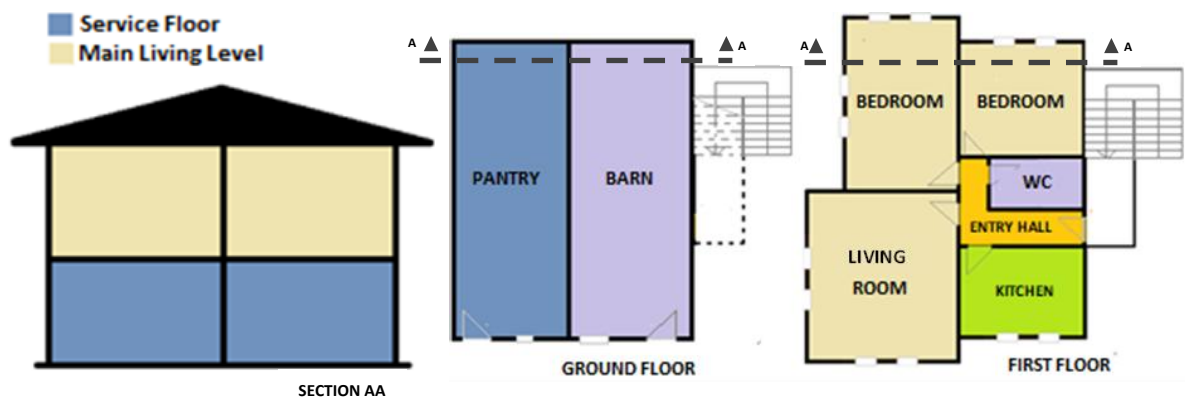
Diagrammatic Drawings of Floor Plans and Section AA of Günyurdu Village TOKİ House Unit (Created by the authors)
